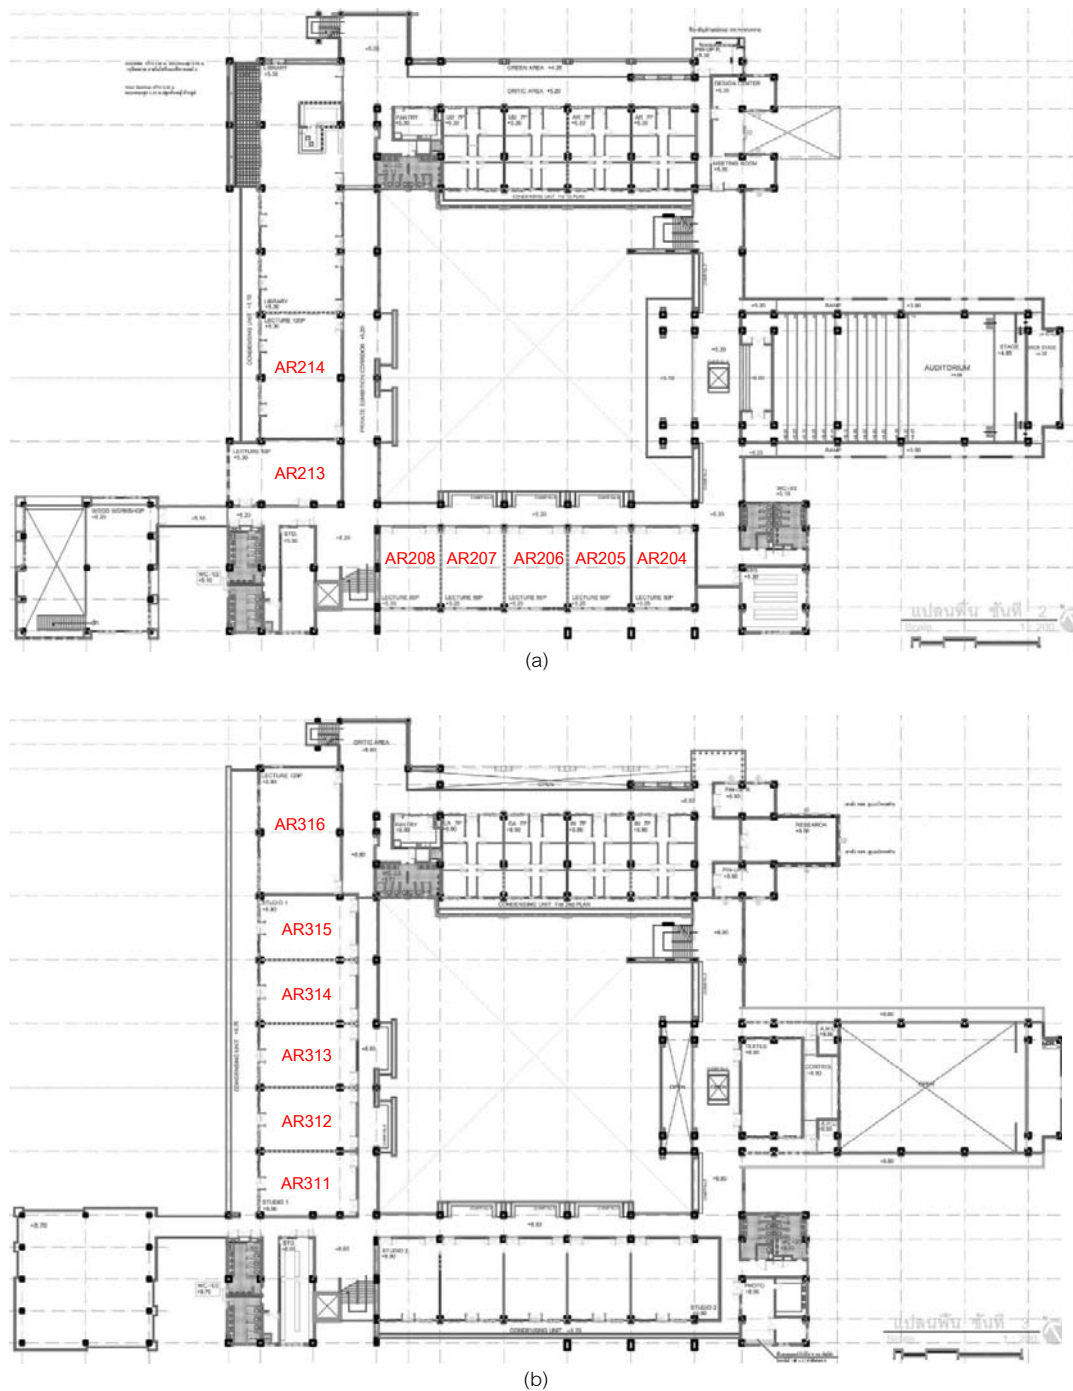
1 Building floor plans show the positions of all lecture rooms: AR204-208, AR213-214 and AR311-316 which located on the first and second floor. (a) first floor plan and (b) second floor plan.
